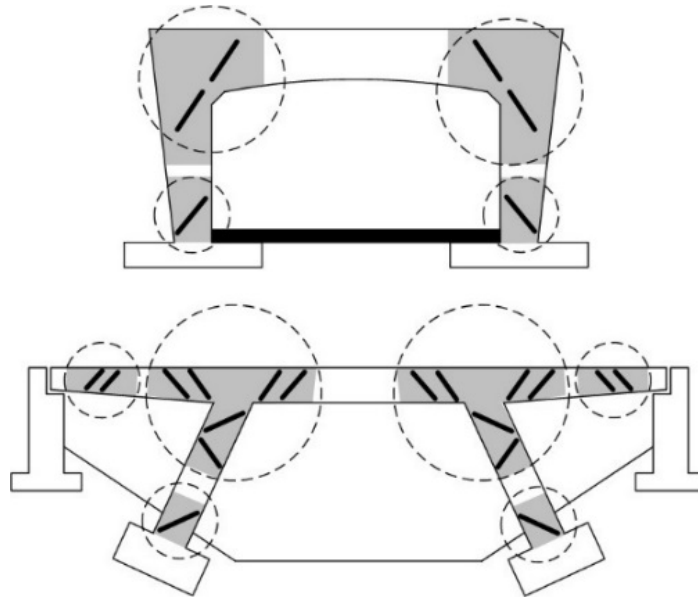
Shear Zones in Single Span and Multi-span Frames
